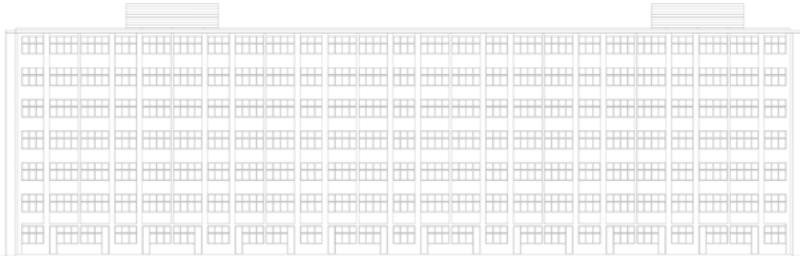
Queenstown New Town 45-48-49 Housing Blocks. Back Façade. Own elaboration based on HDB.
